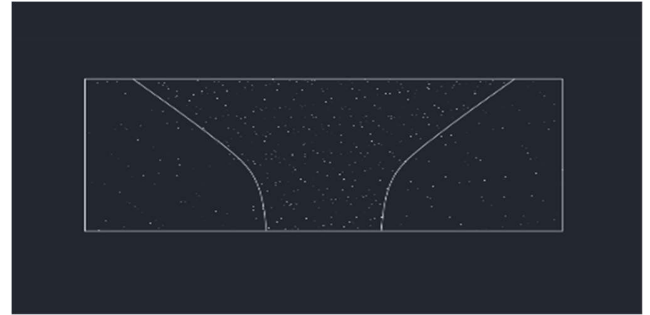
Failure plane of the soil observed for square pattern belled pile arrangement having $L/d = 8$
